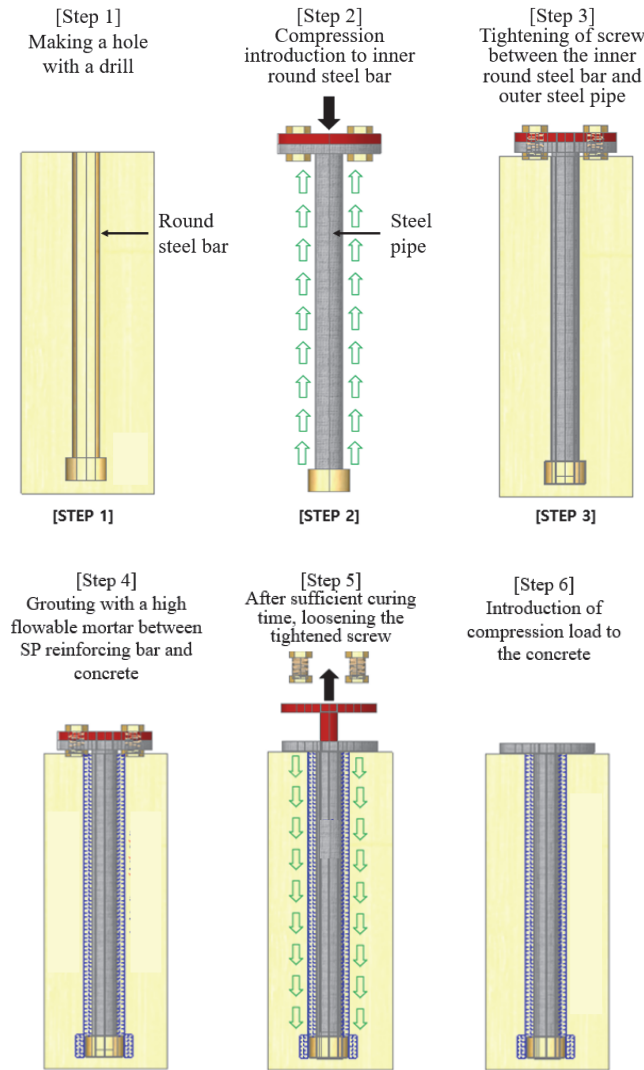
Prestressing method of a concrete using SP reinforcing bars
